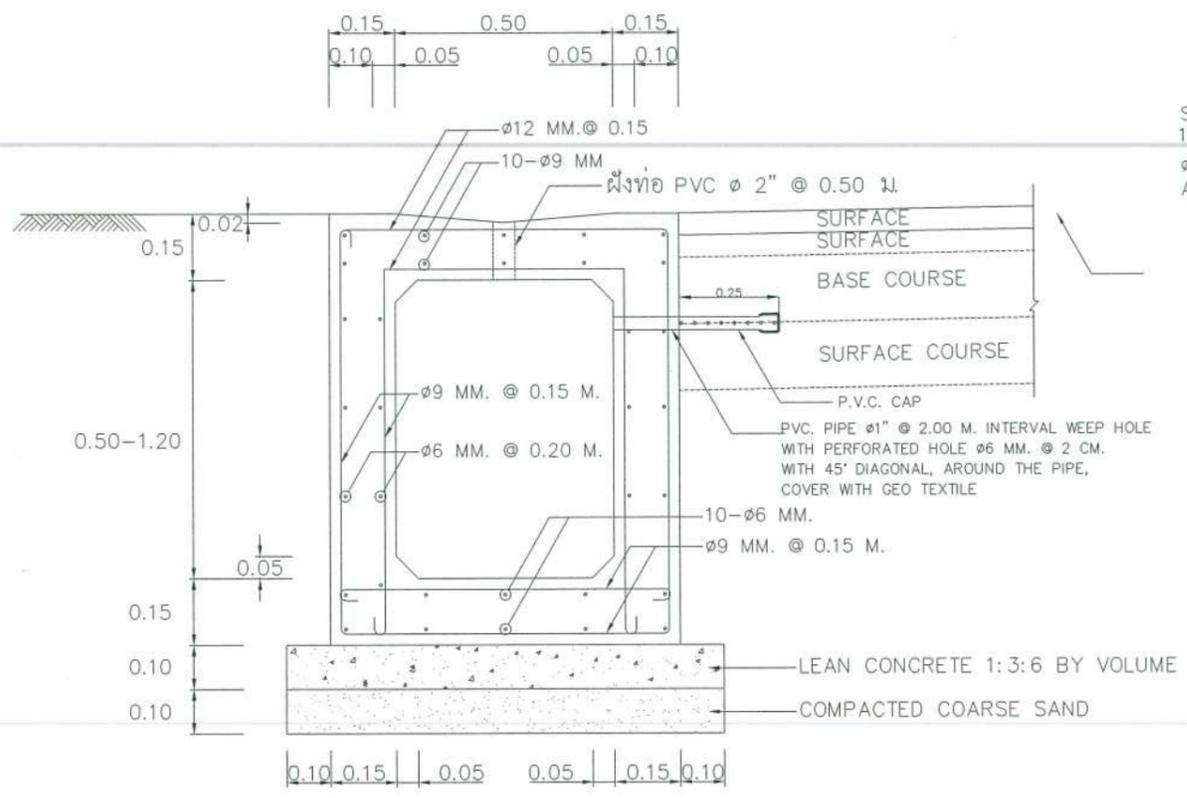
DETAIL FOR CONSTRUCTION OF CONCRETE CURB AND MEDIAN
